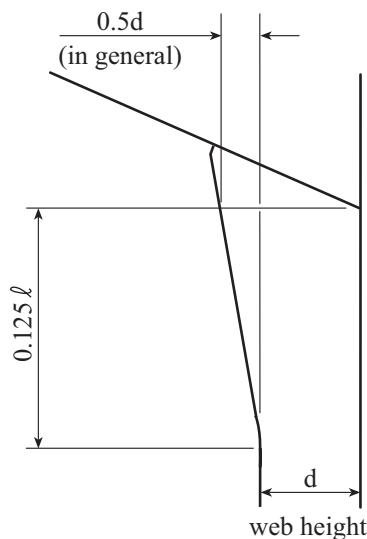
Dimensions of the upper and lower bracket of the side frames
